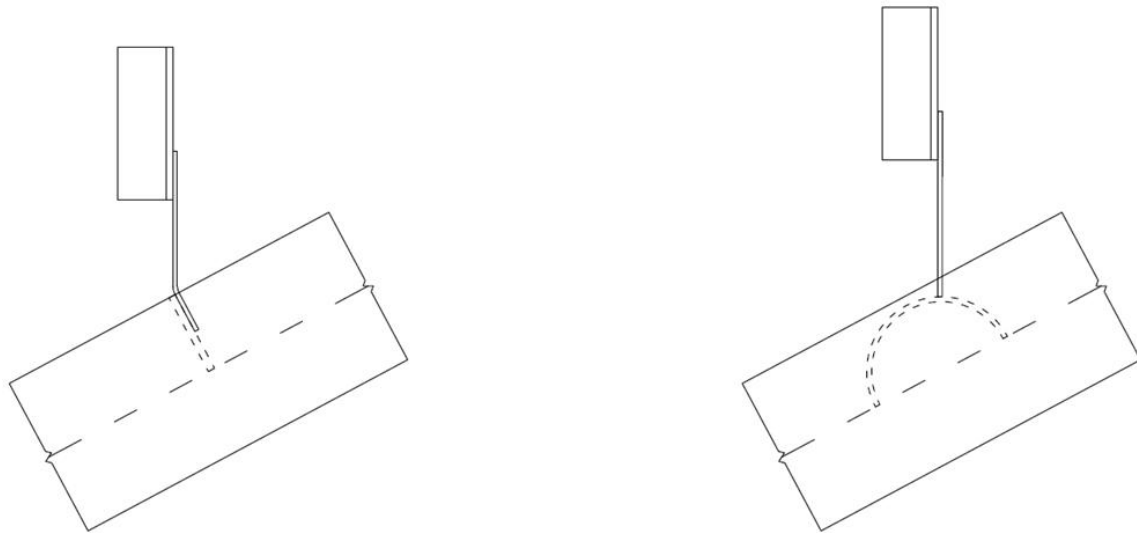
(a) Bent Plate Connection and (b) Half Pipe Stiffener Connection
